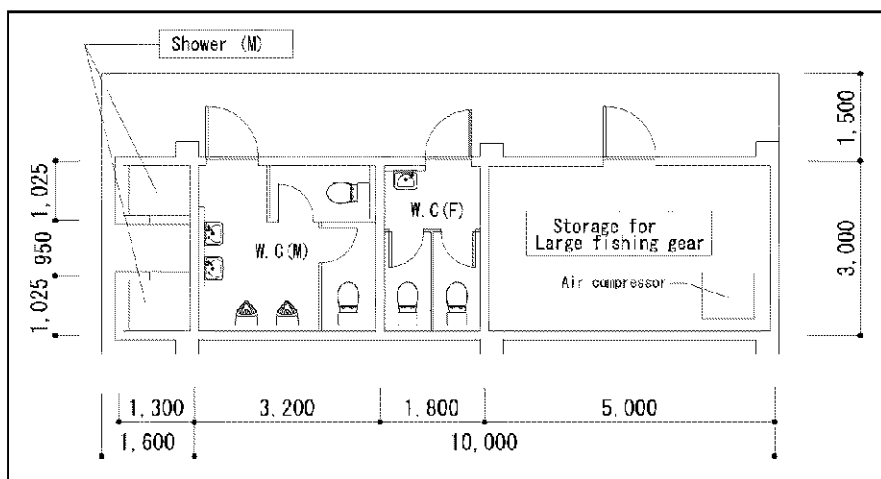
(31) Layout for Storage of Large Fishing Gears and Toilet
